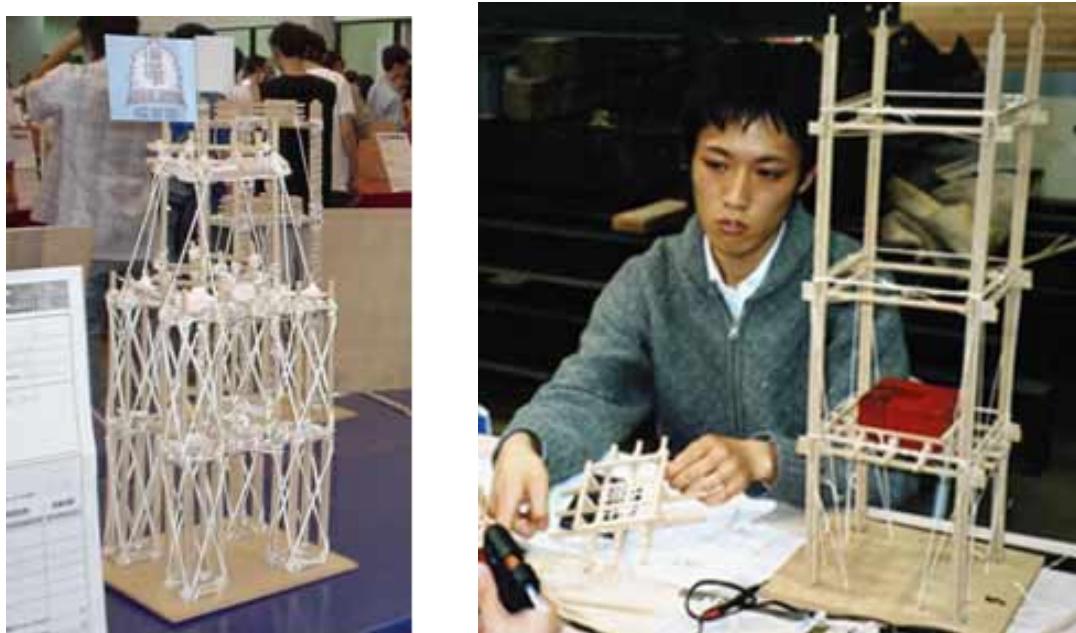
Typical UK (left) and Japanese (right) students' models.
